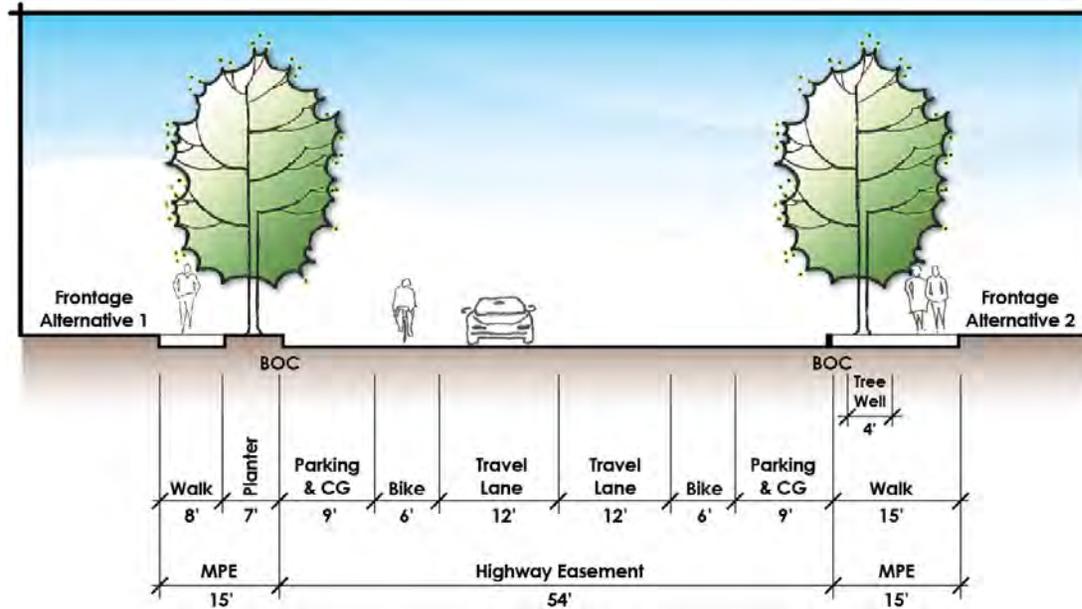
"D" STREET (NORTH/SOUTH STREET IN TOWN CENTER)
